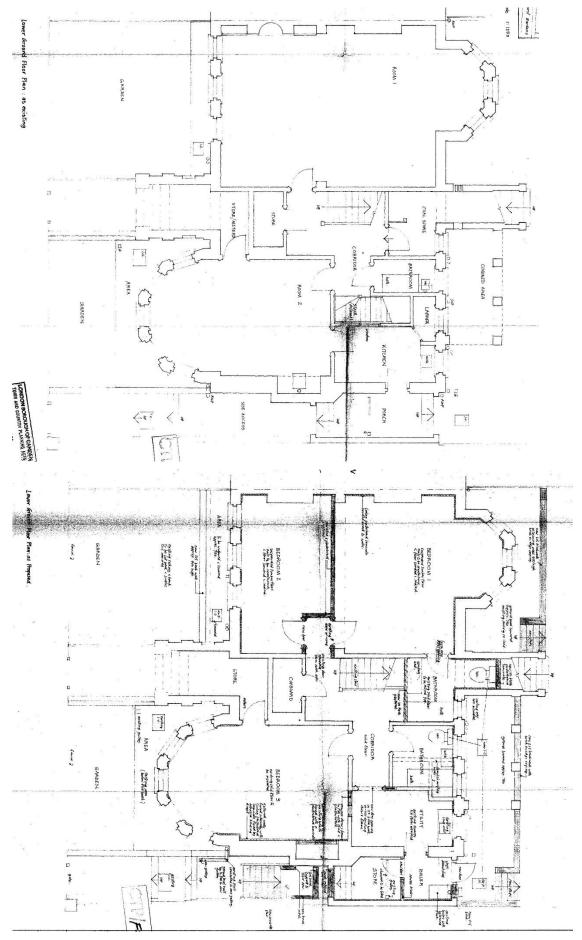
Existing (top) and proposed (bottom) lower ground floor plans, 1981.
